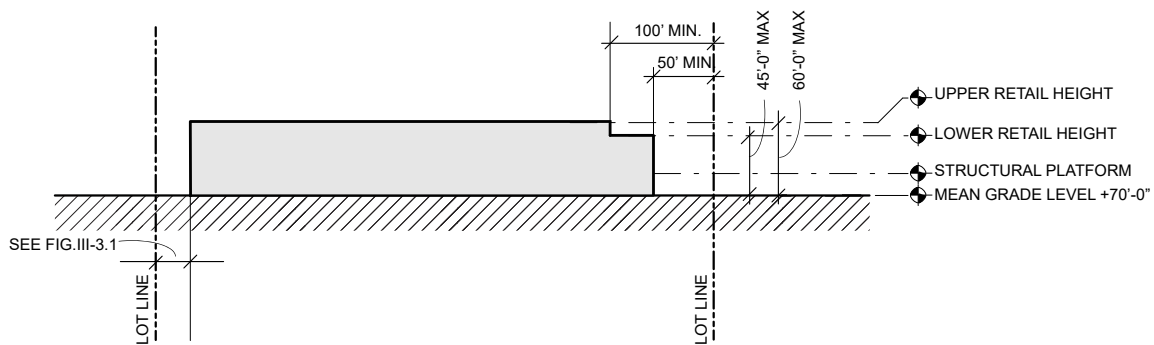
BUILDING HEIGHTS - RETAIL SITE A; OFFICE
